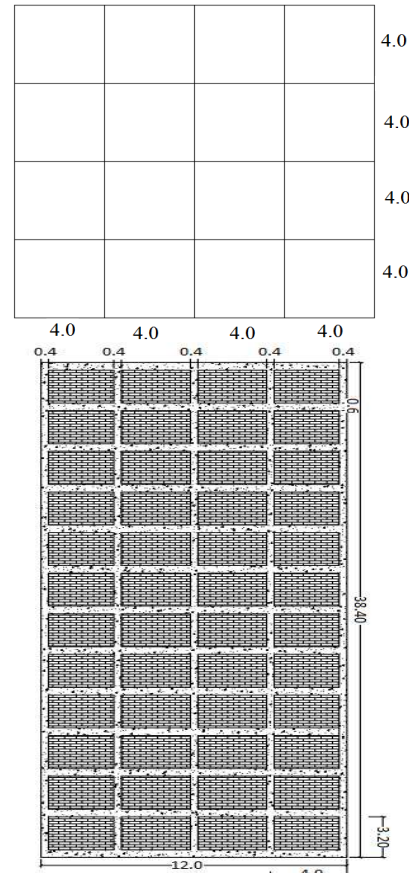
Elevation and Plan of Solid Infilled Frame
